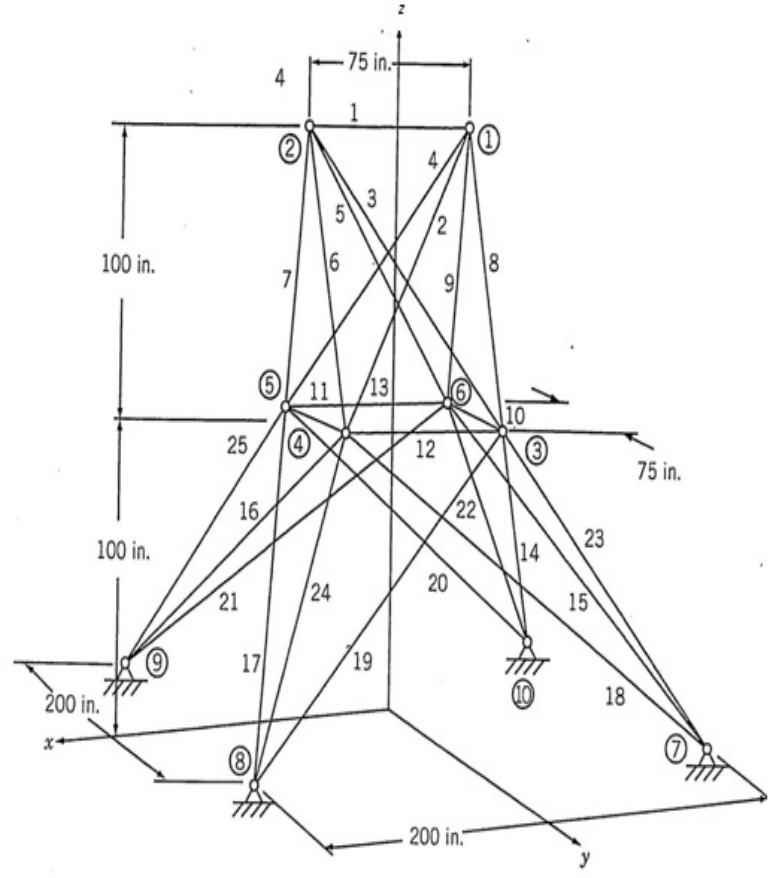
Twenty-five bar space truss (Rao (2009))
